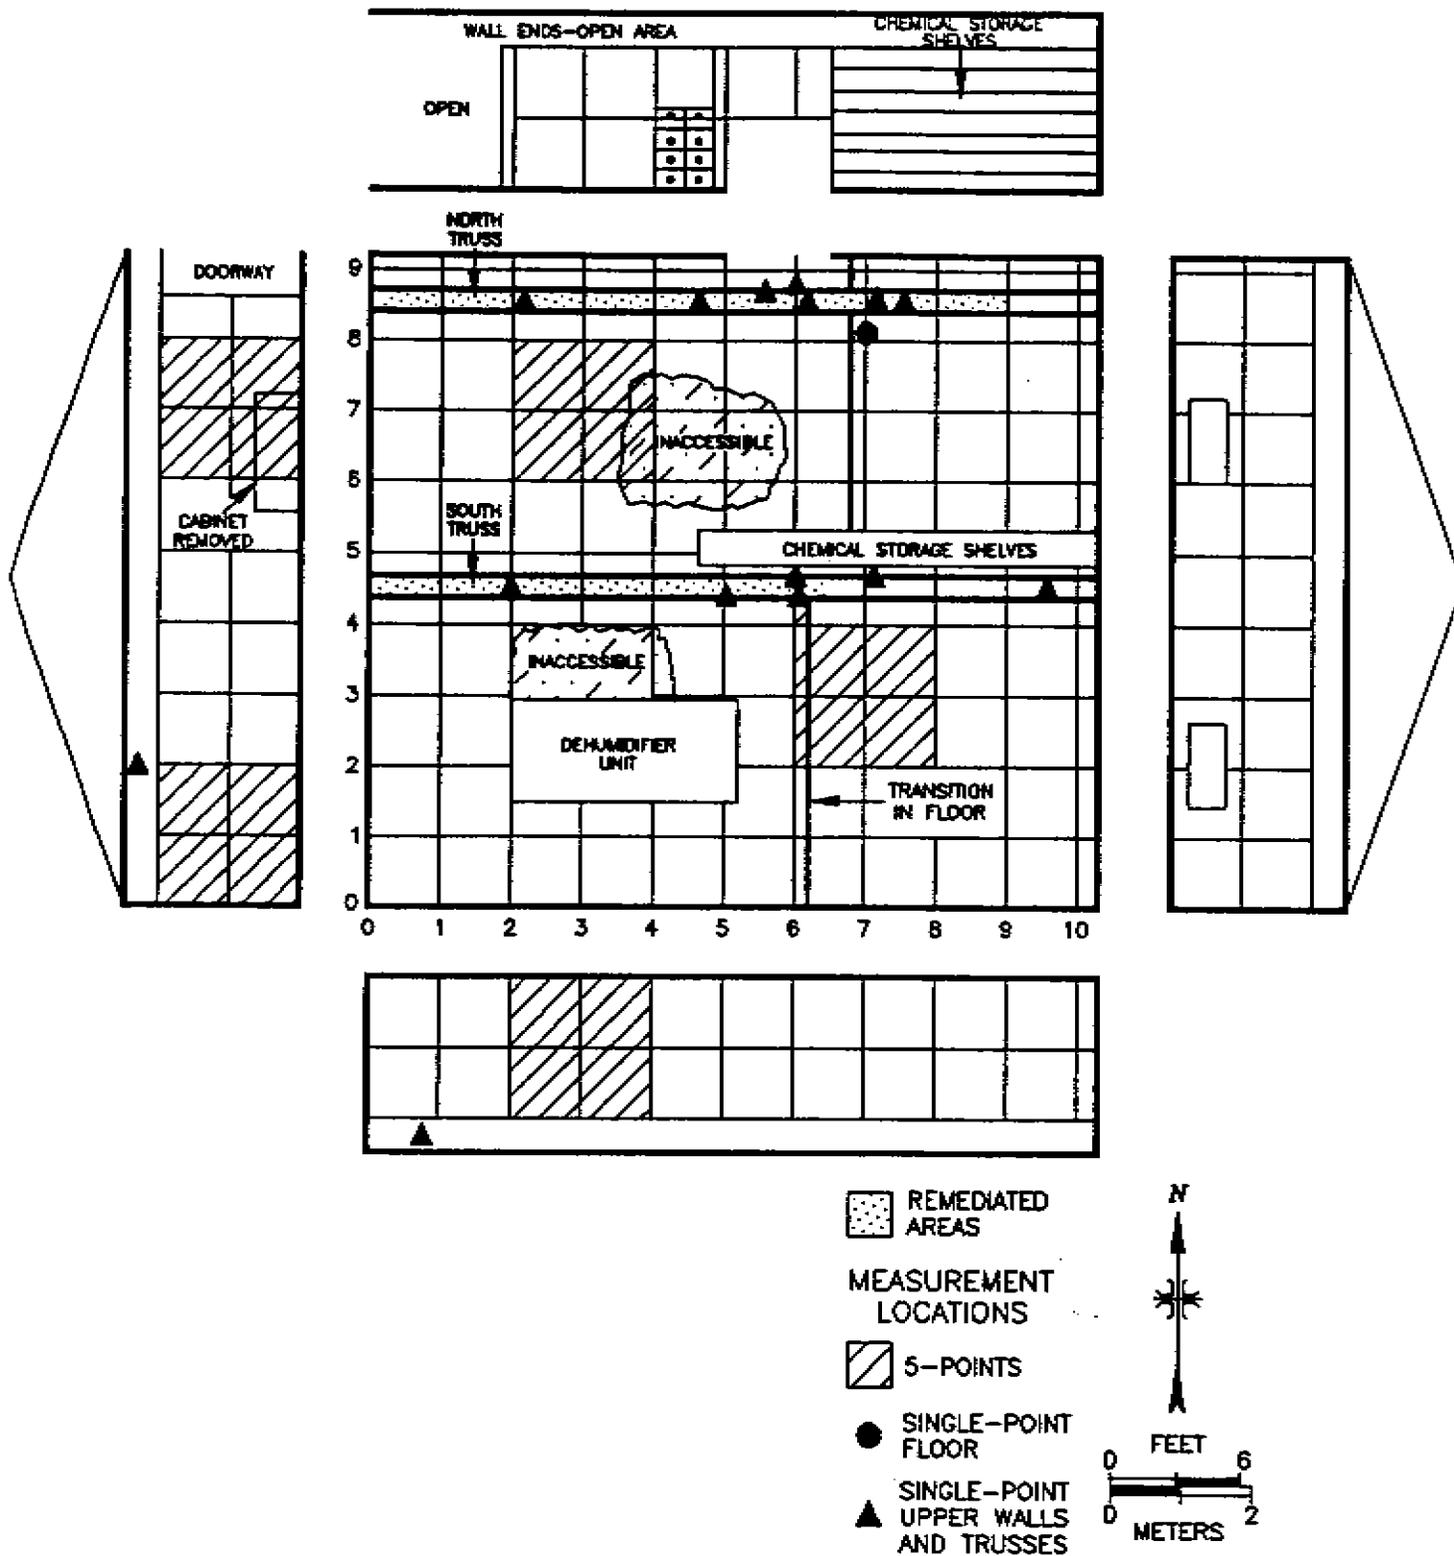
Building 17, Second Floor Storage Area, Indicating Measurement Locations
